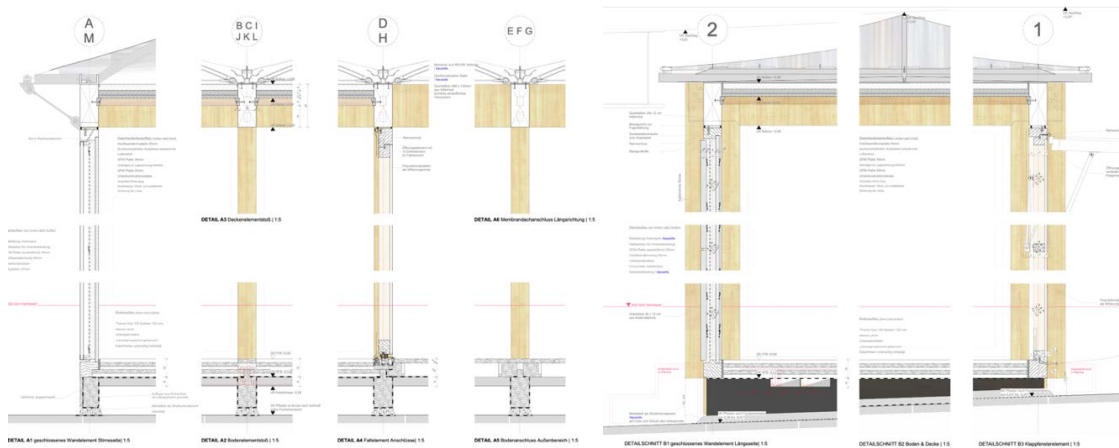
Timber construction: details and sections, source: HFT Stuttgart.
